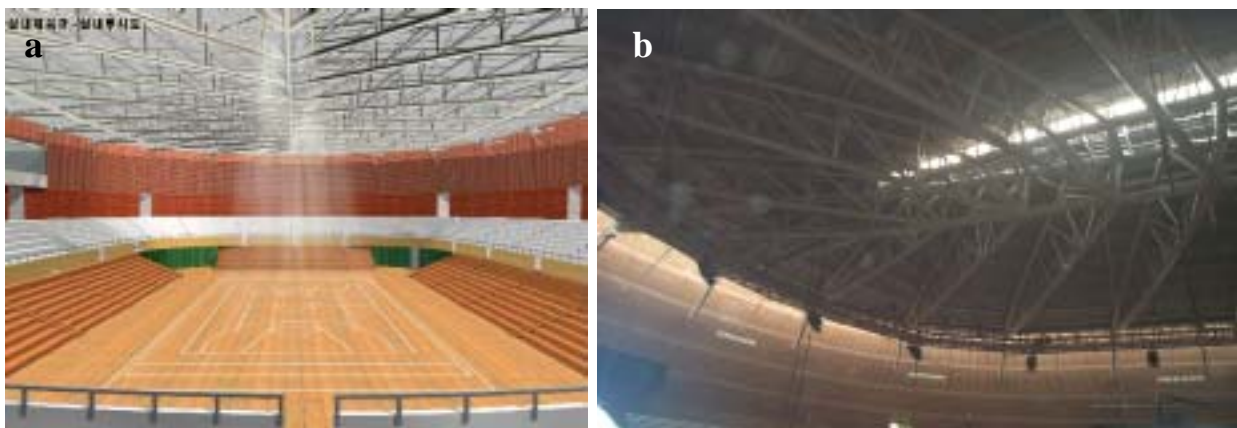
a) Interior view - perspective, b) Interior view – construction
